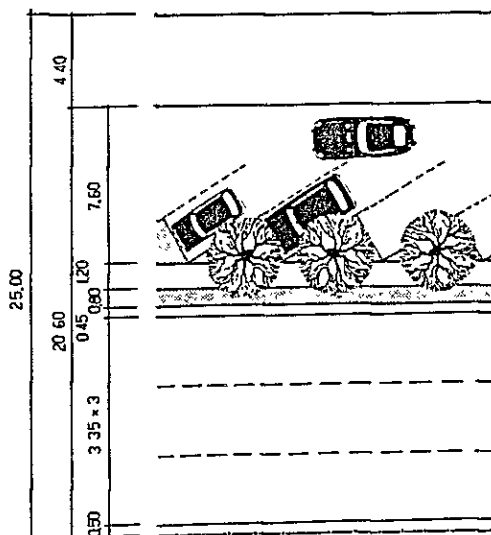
PEDESTRIAN AND PARKING SPACE ALONG VIA ESPANA
